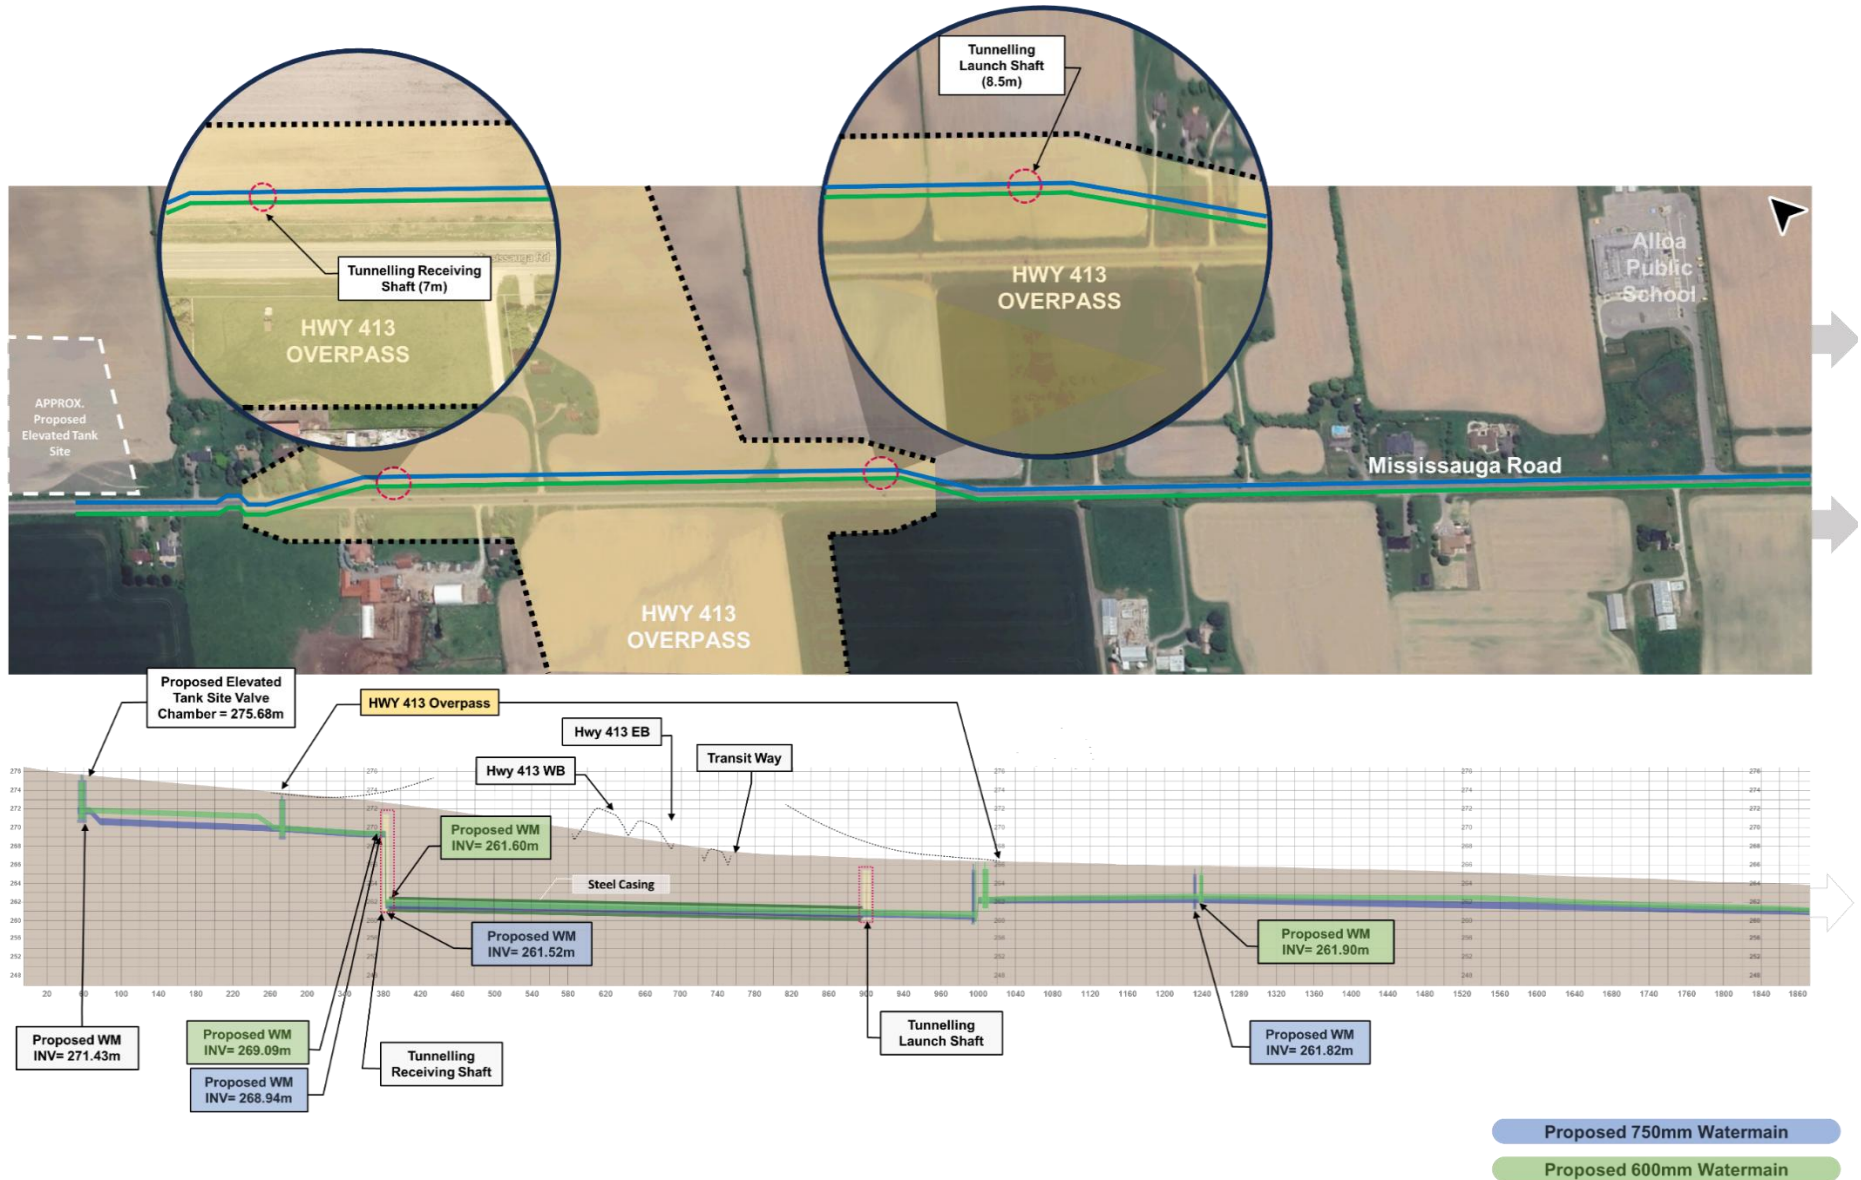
Mississauga Road Alignment Plan and Profile (1/2)
